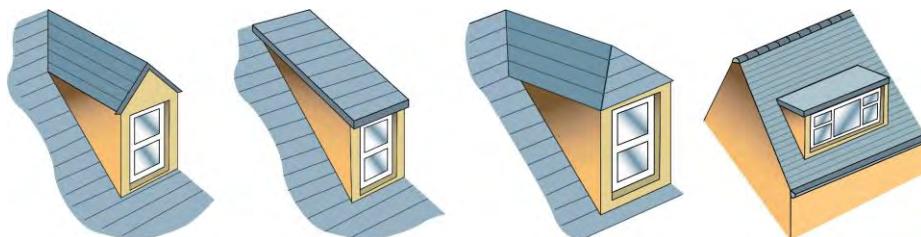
Example of roof types for dormer windows left to right: Gable, shed, hipped and flat.
